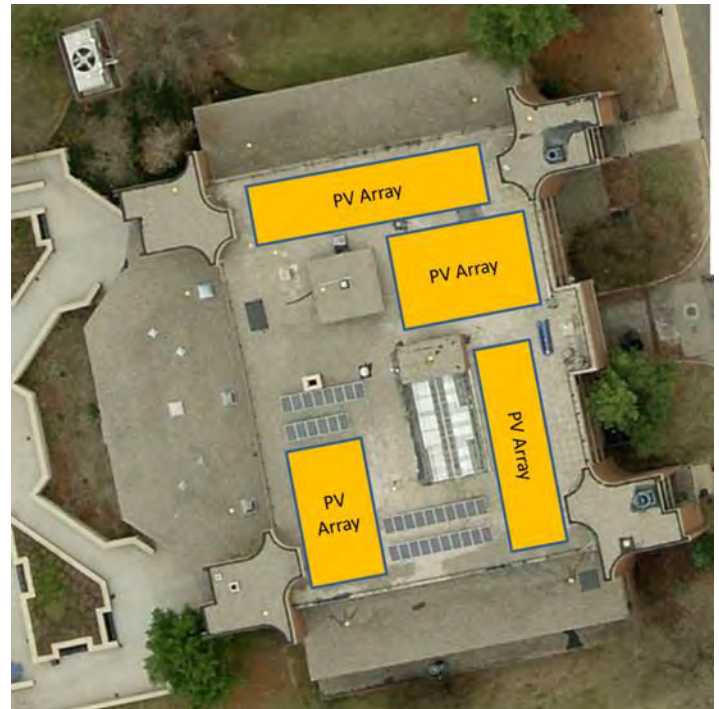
Roof of Smithtown Science Center with possible PV array arrangement.
